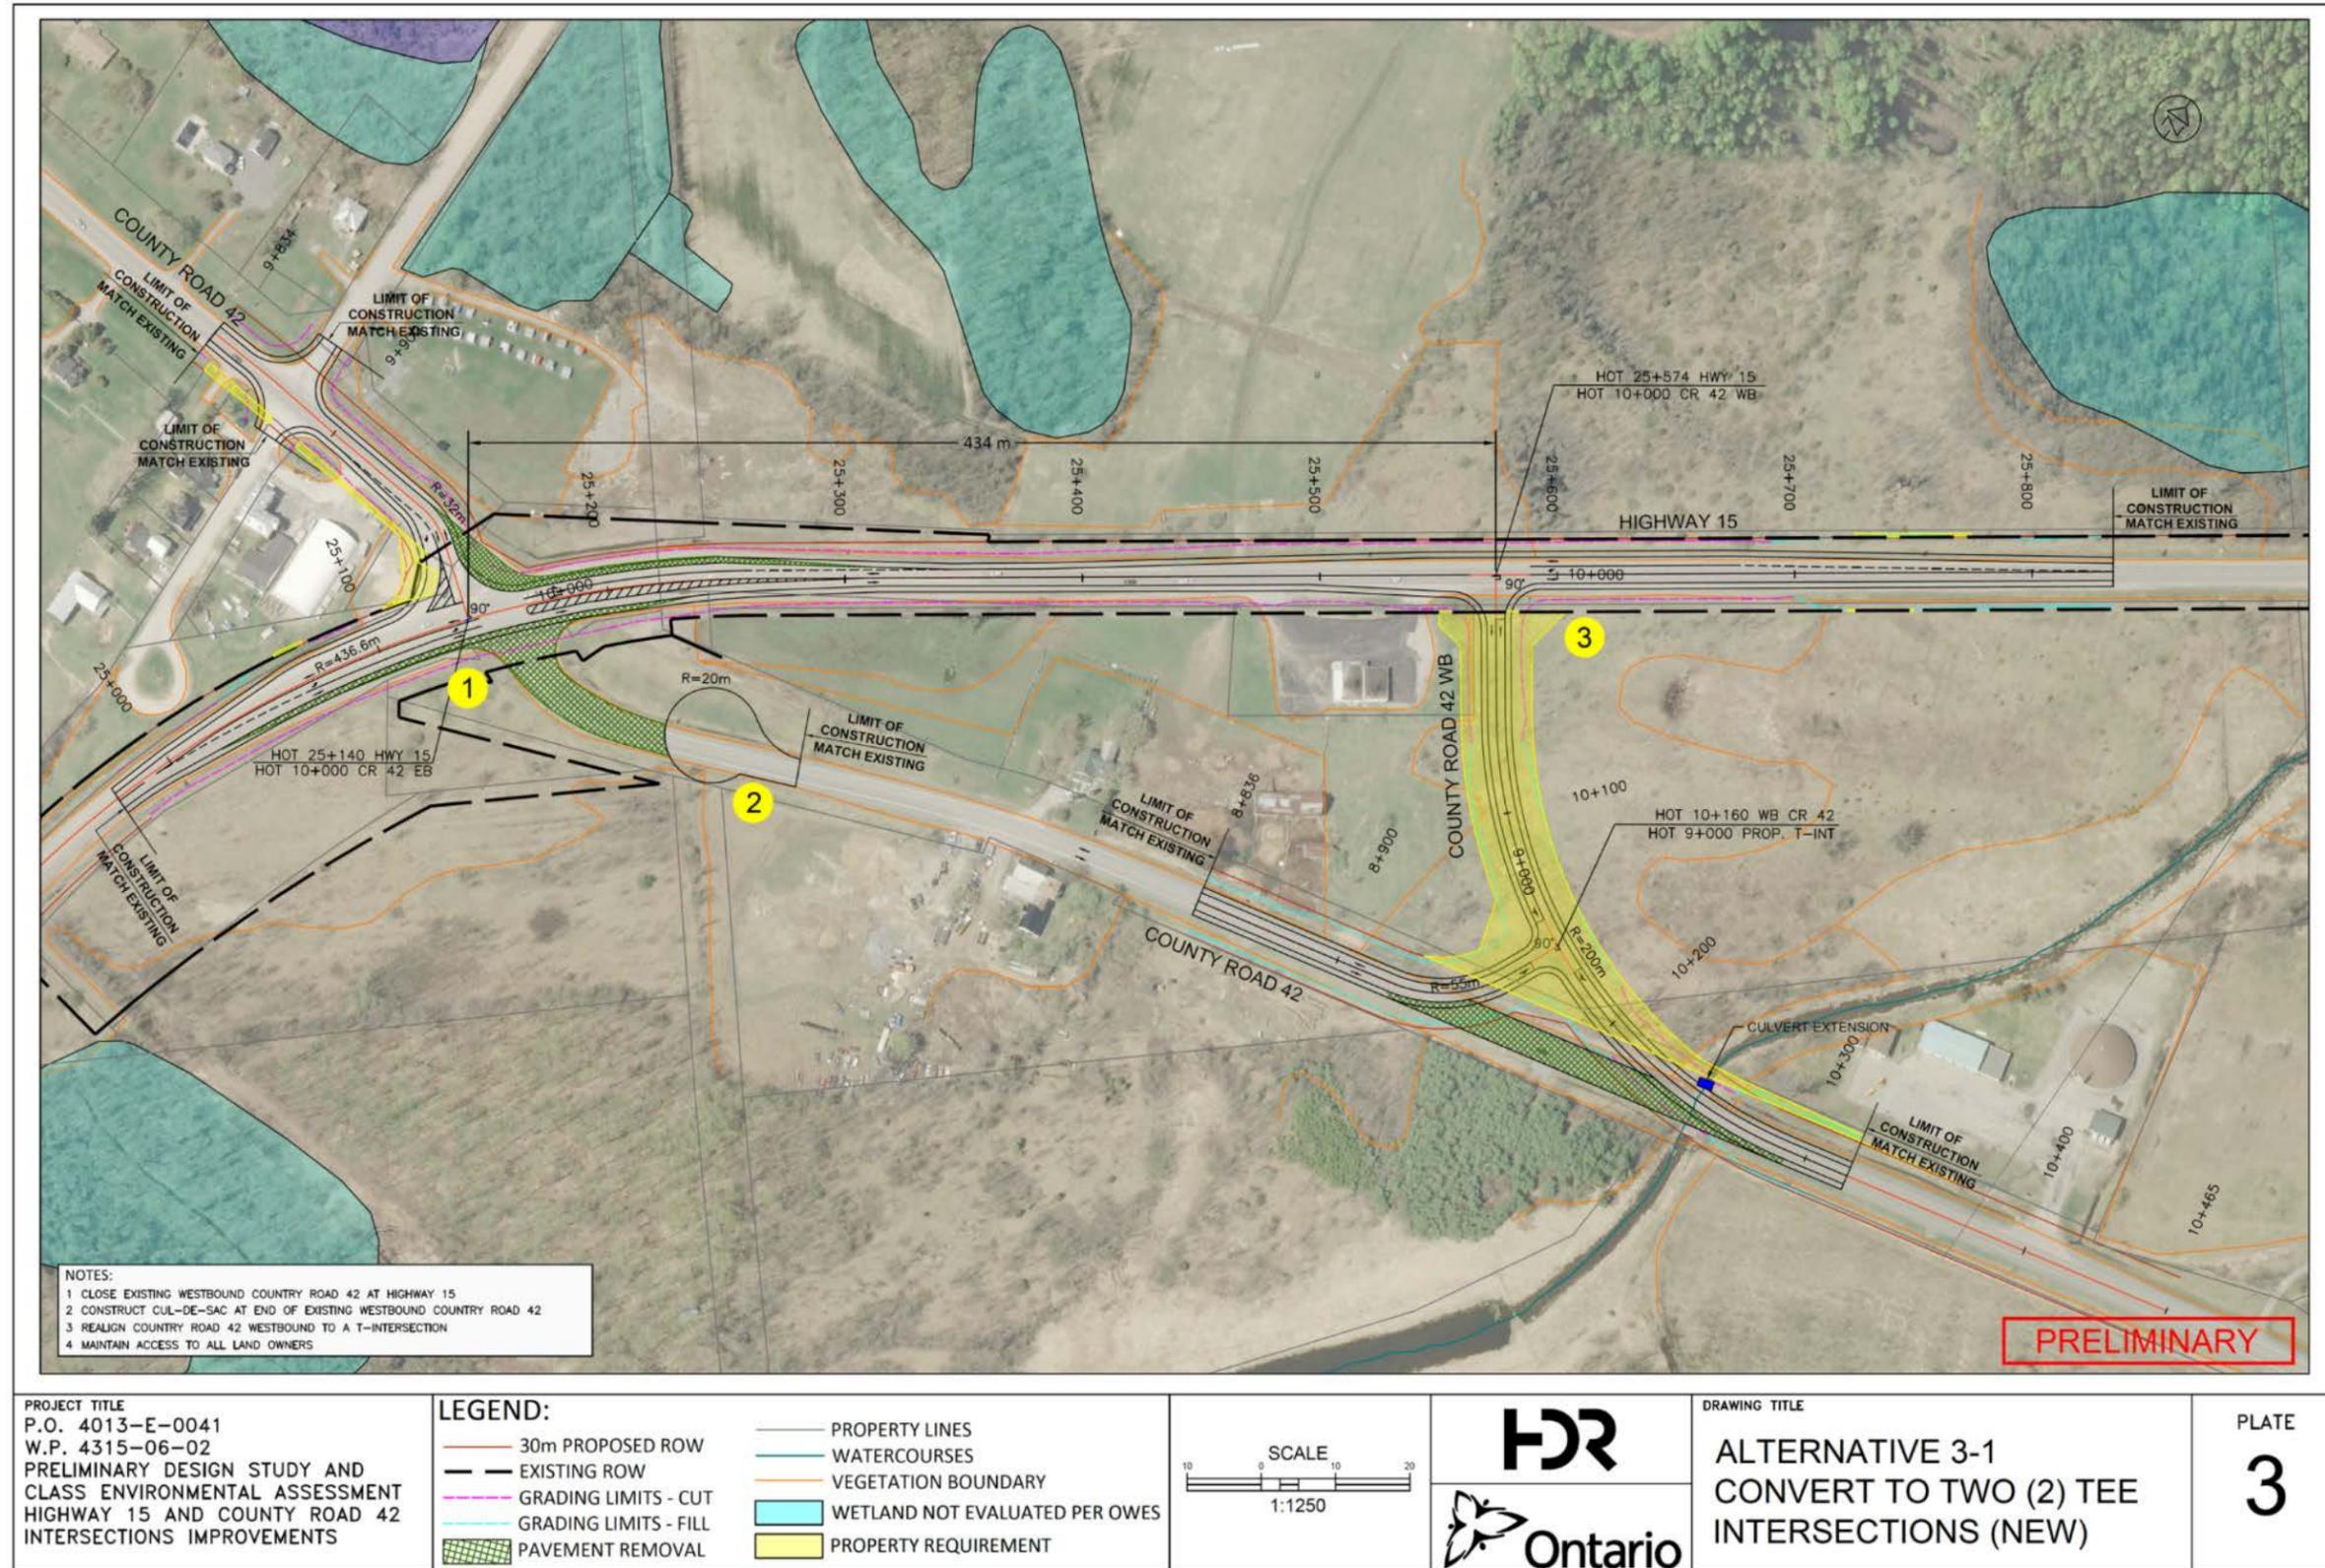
ALTERNATIVE 3-1: CONVERT TO TWO (2) T-INTERSECTIONS
